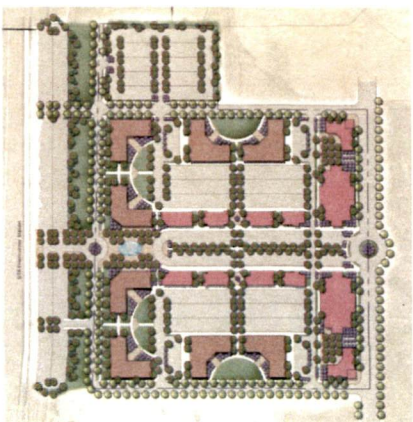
SUMMIT RIDGE 35 ACRE PARK
